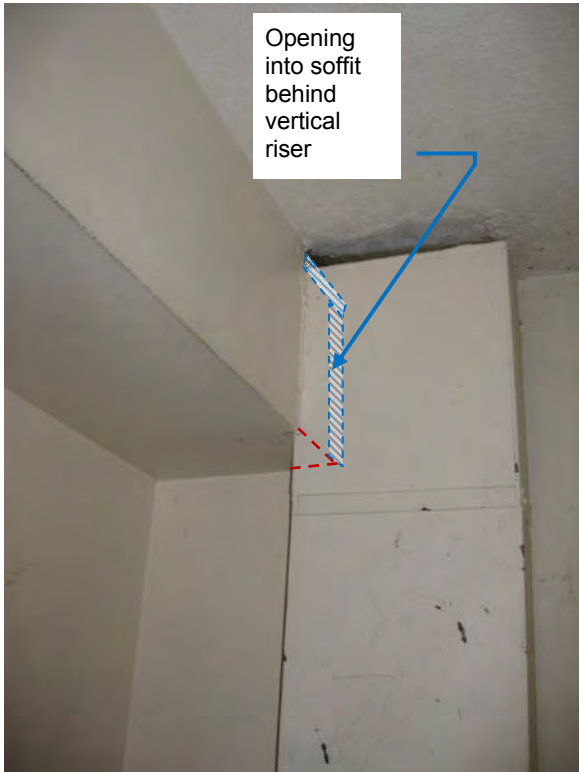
Opening into soffit at second floor of previous low-rise mock-up apartment
